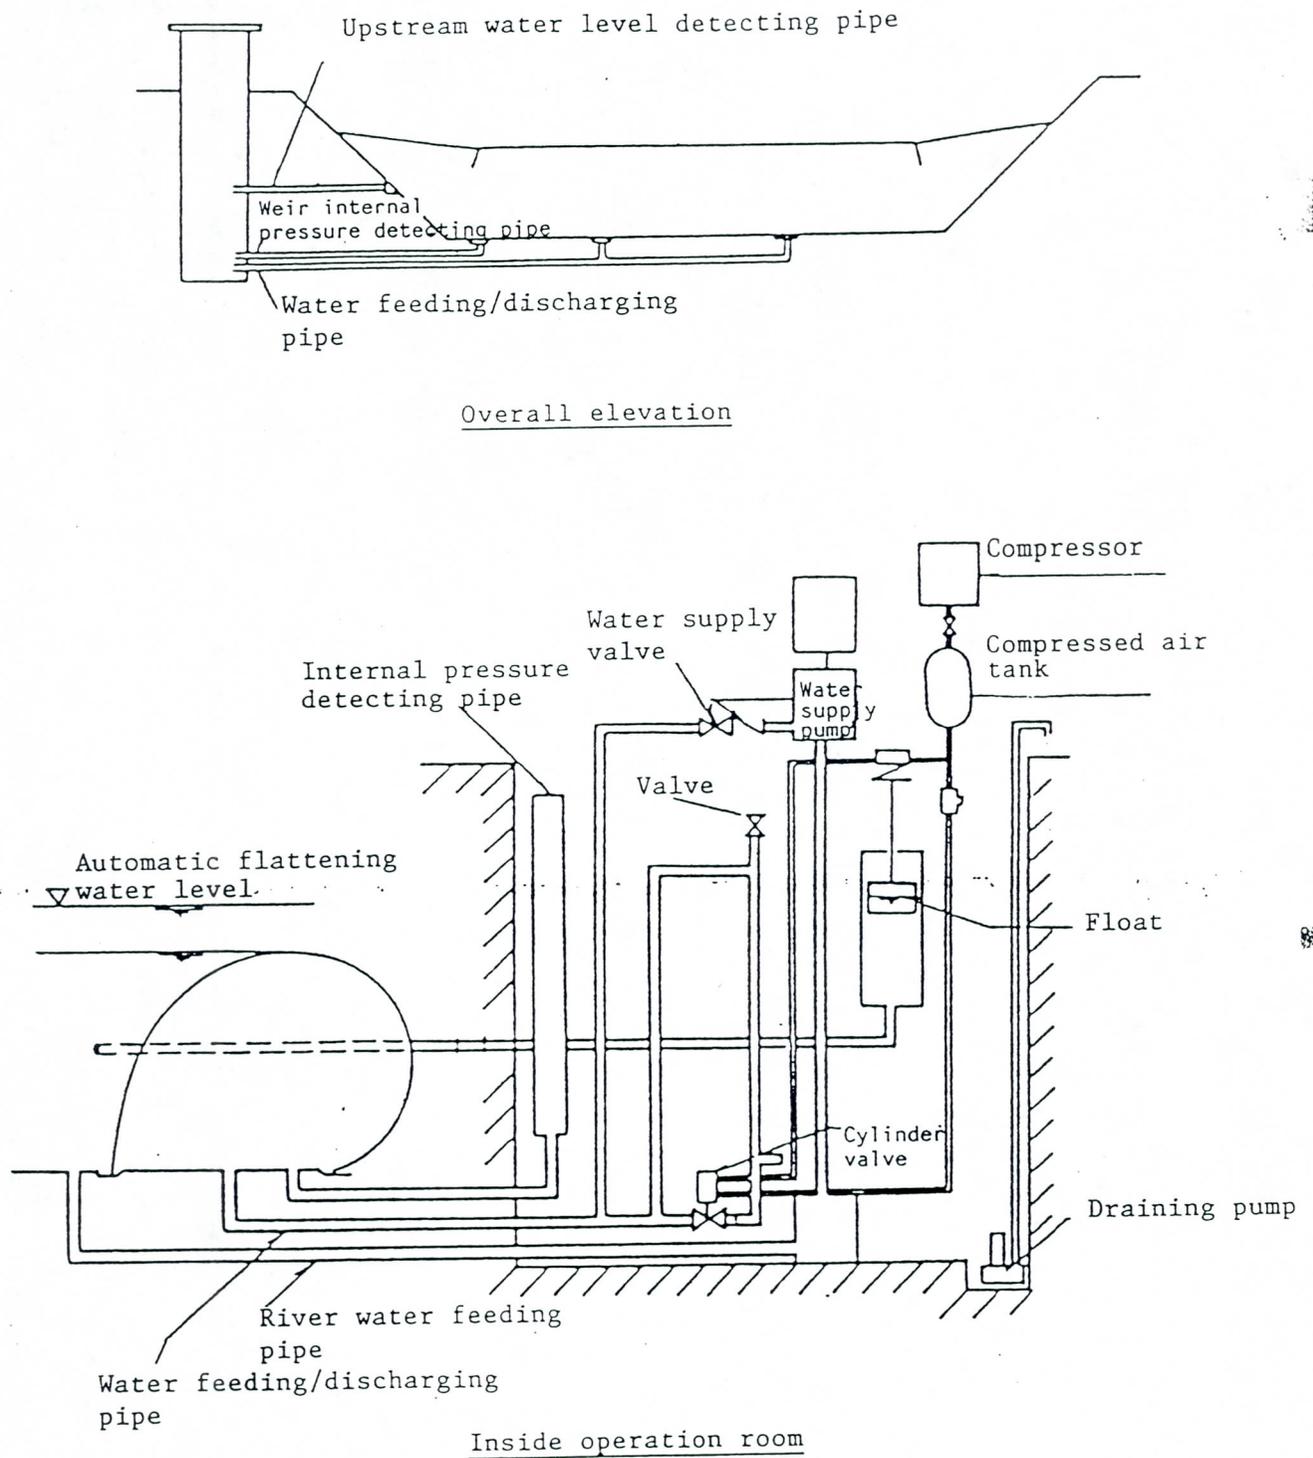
Example of installation of feeding/discharging piping (Water type)
